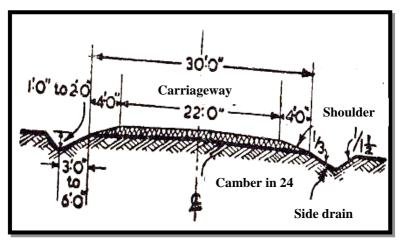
Typical Cross Section of a Sand Clay and Gravel Road
